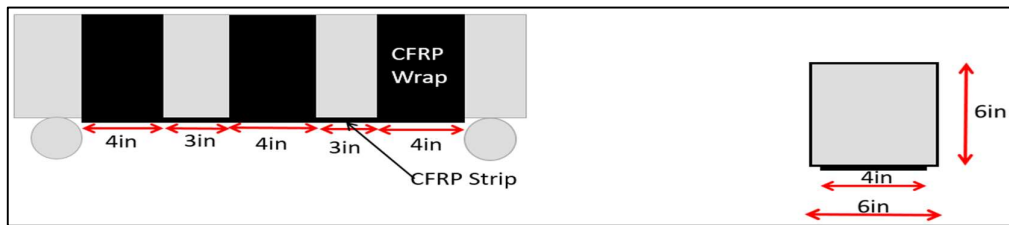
Side View of beams strengthened by CFRP Strip
